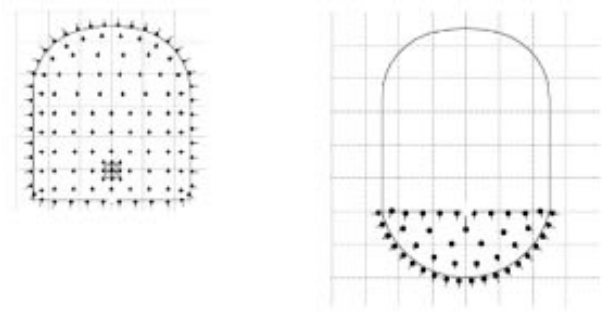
TASQ tunnel with separate excavation of top (left) and bench (right).
